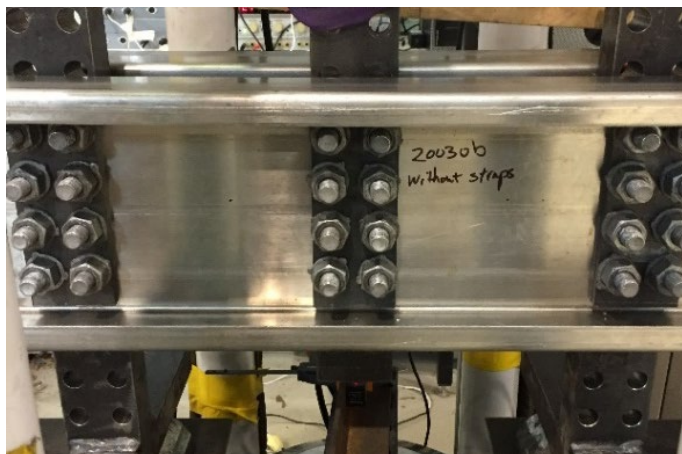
Shear tests assembly of 20030-2WSP-0AS-2VRB.
